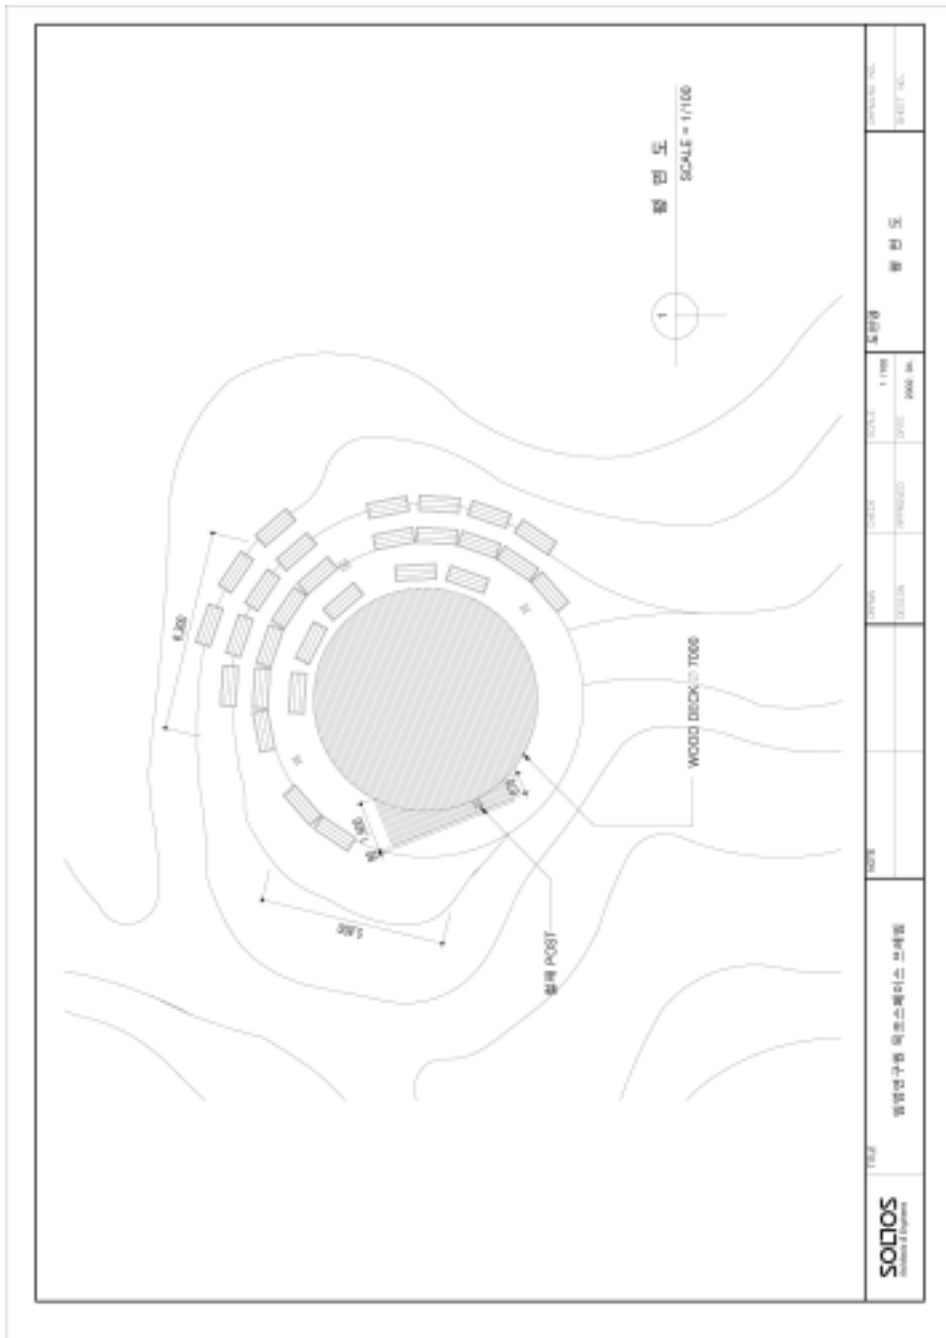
Location of wood space truss structures constructed in Jungbu Forest Experiment Station
